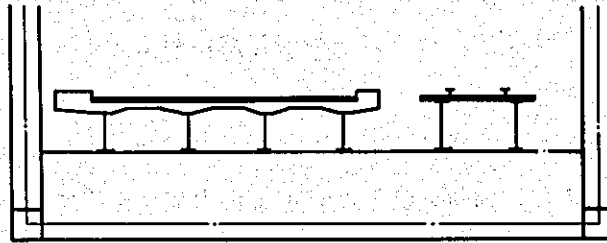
Stringers fixed to the Web of Cross Beams
